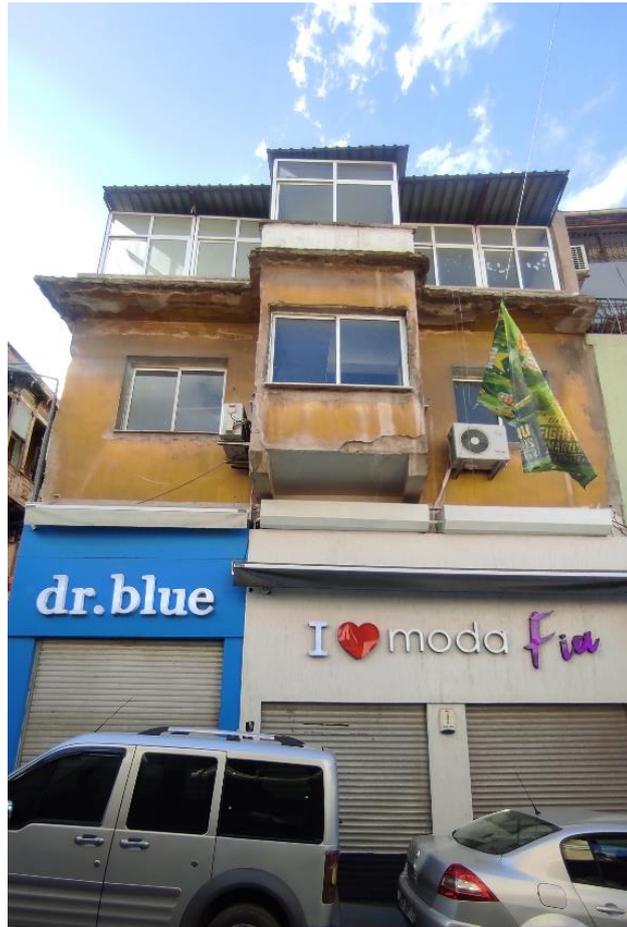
Example of a building built between 1975-2005 and in poor condition,
